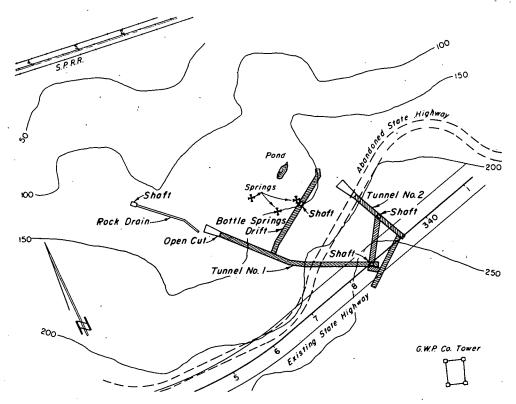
Drainage tunnels to prevent landslides. System of drainage tunnels installed during construction of new highway, designated as "Existing State Highway" on sketch, near Crockett, Calif. (Courtesy of California Division of Highways)
